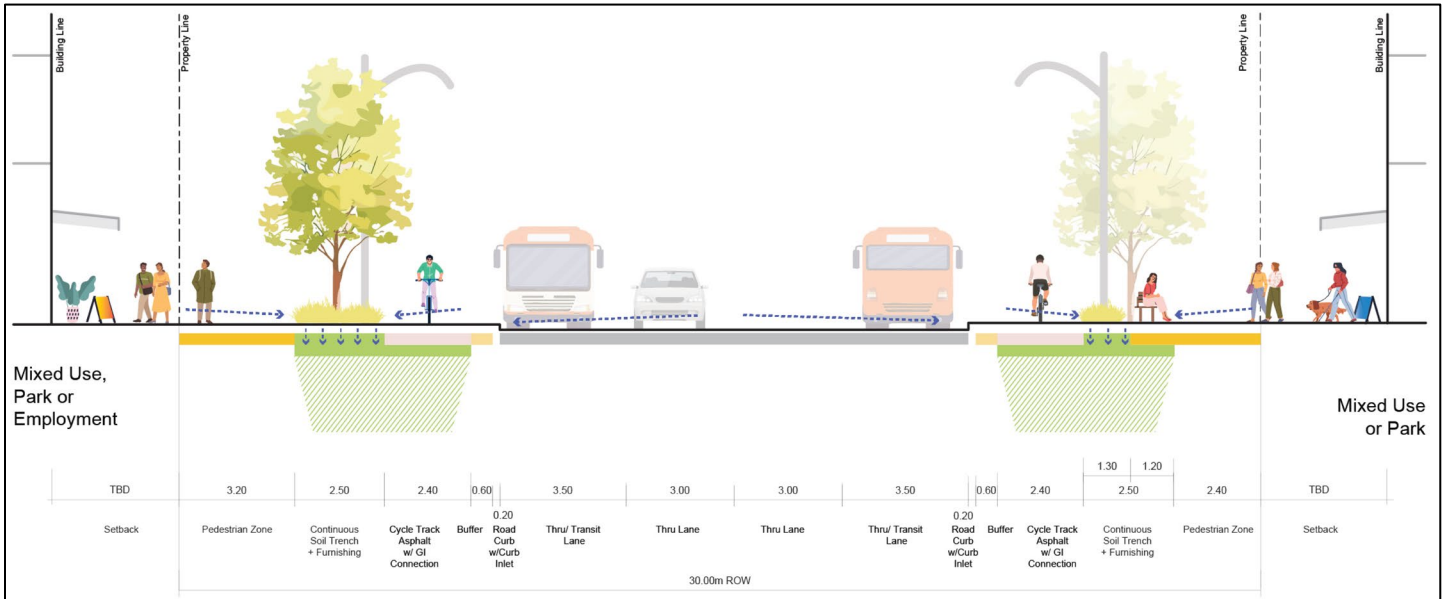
Dufferin Street (Northern Street to Sheppard Avenue West) Cross-Section - Option 1
